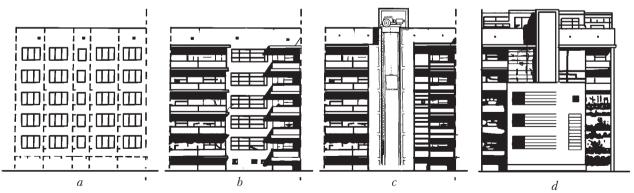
Reconstruction of large-panel residential houses in Finland: a – appearance of building; b – added loggias; c – elevator shaft; d – added solarium
